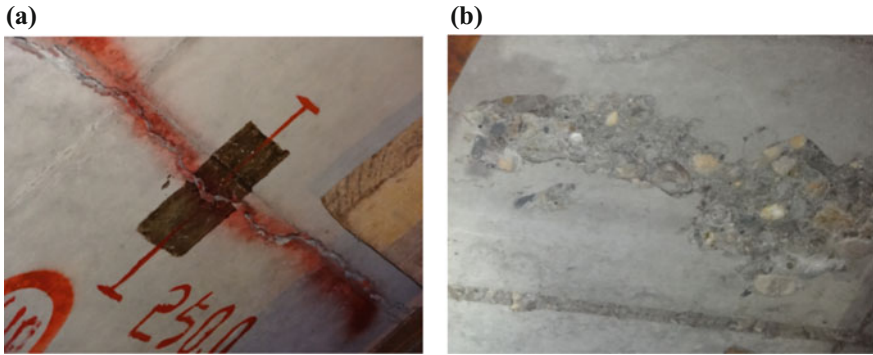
Longitudinal crack at intrados of tunnel lining a observed longitudinal crack in tunnel arch shoulder (mileage DKI68 + 340); b observed longitudinal crush at the vault area (mileage DKI68 + 349)
